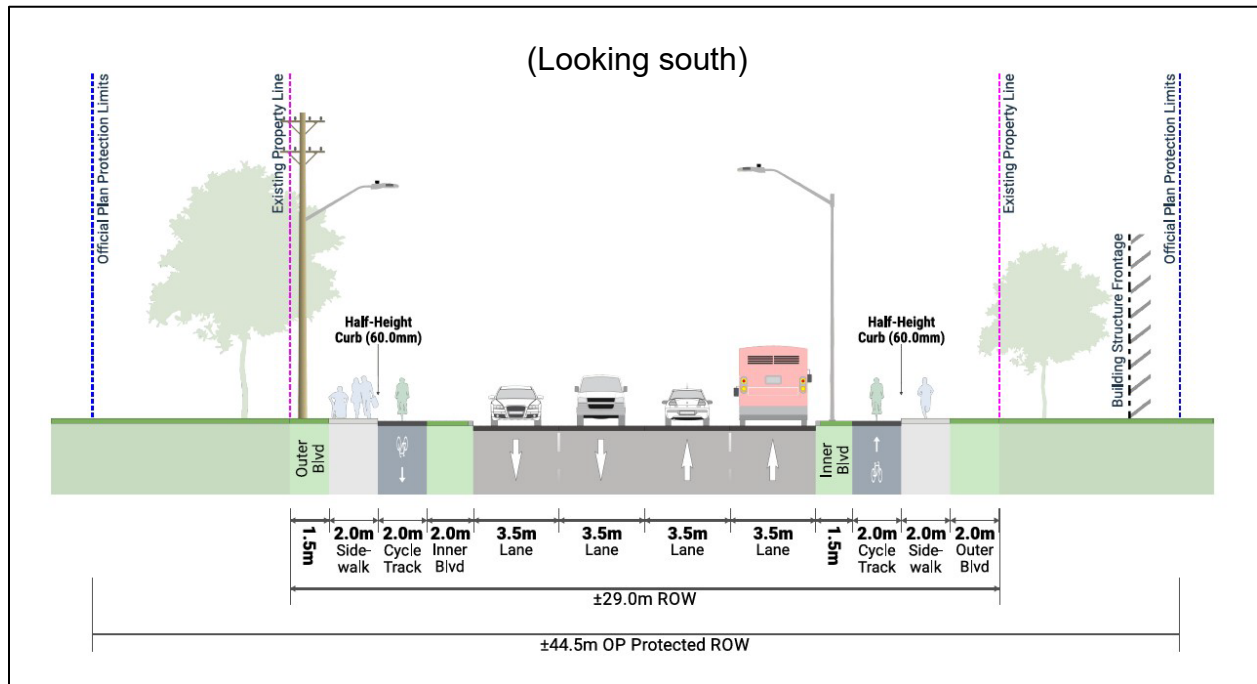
Segment 1 – Hemlock Road to North of Montreal Road
